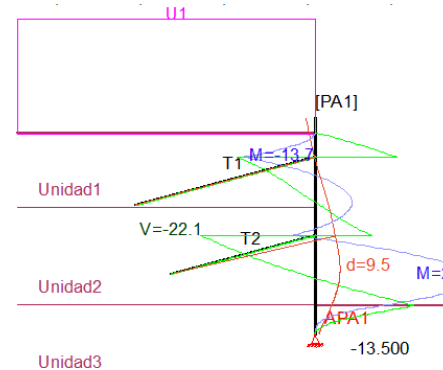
Deformations (mm) and mechanical elements (Moment in t-m and Shear in t) in the construction stage for diaphragm wall with 110 t active anchors.
